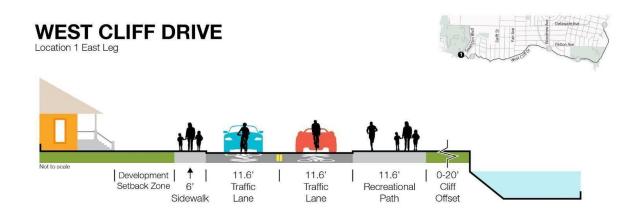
Cross Section of West Cliff Drive Proposed Alternative 1 Enhancements at Swanton Blvd
